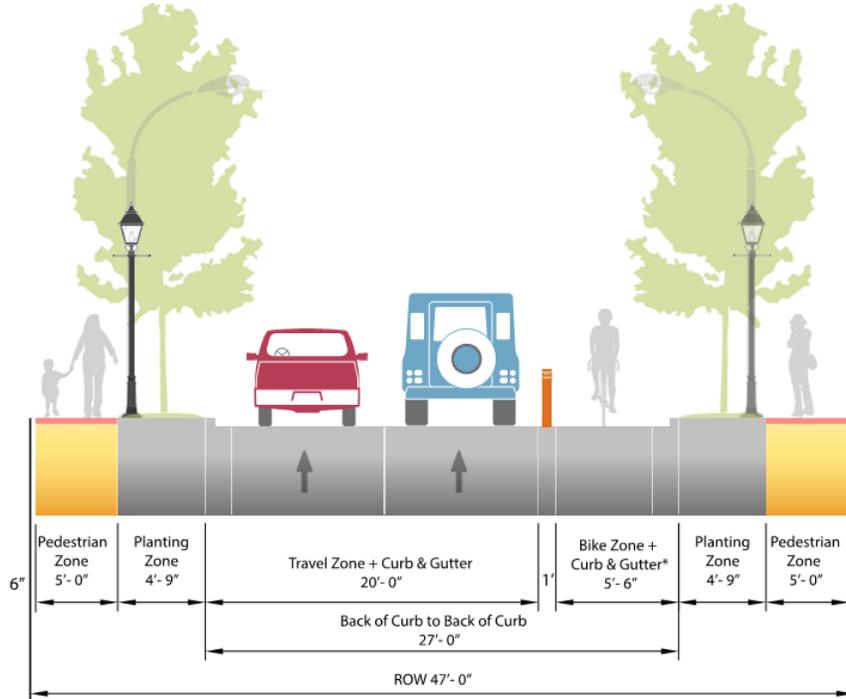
Proposed Local Street One-Way Alternative Complete Streets Cross Section
